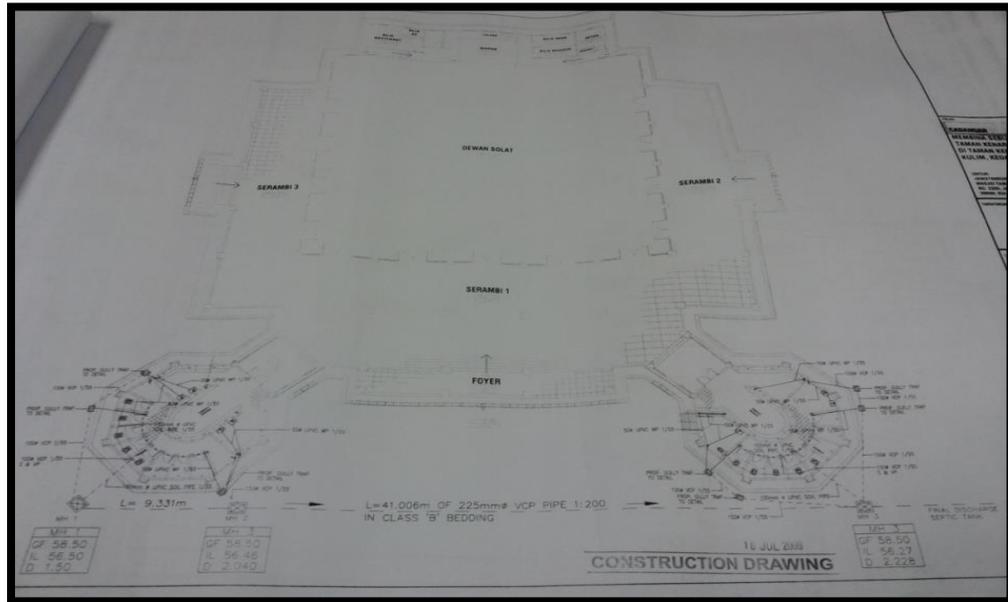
PROJECT'S CONSTRUCTION DRAWING
